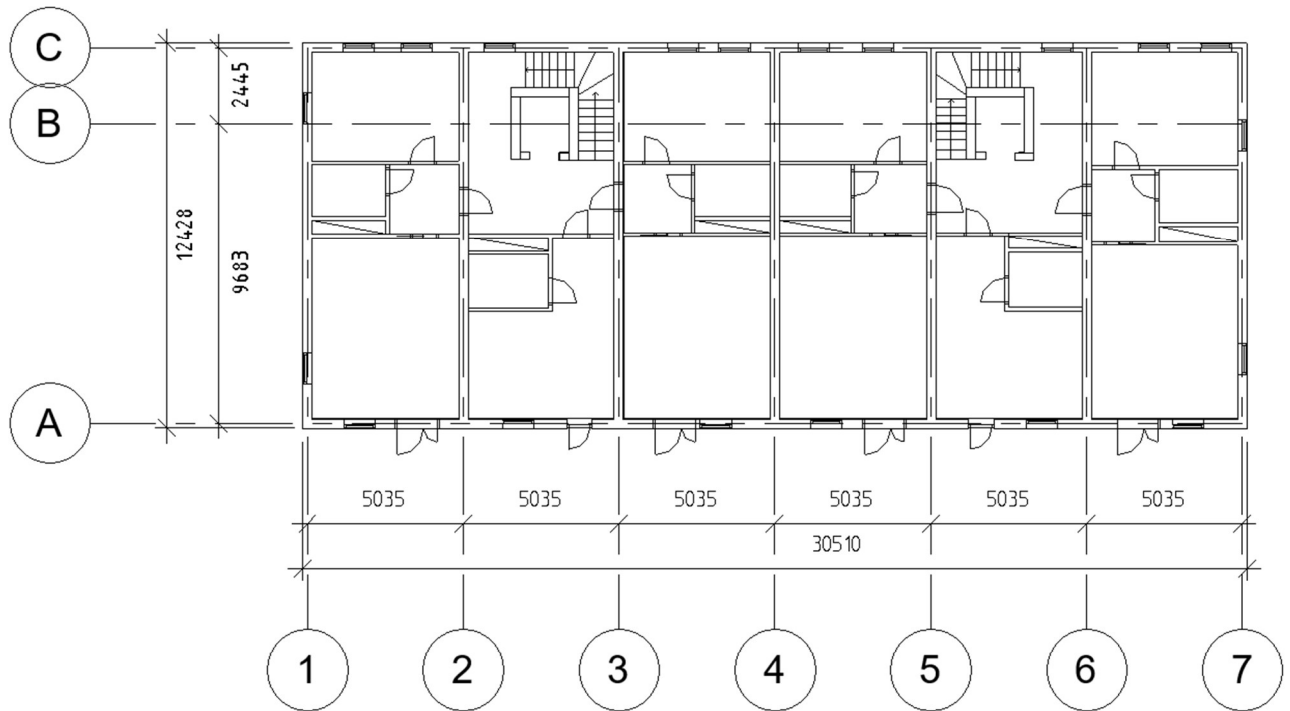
Plan of storeys 2 and 3 (unit: mm).
